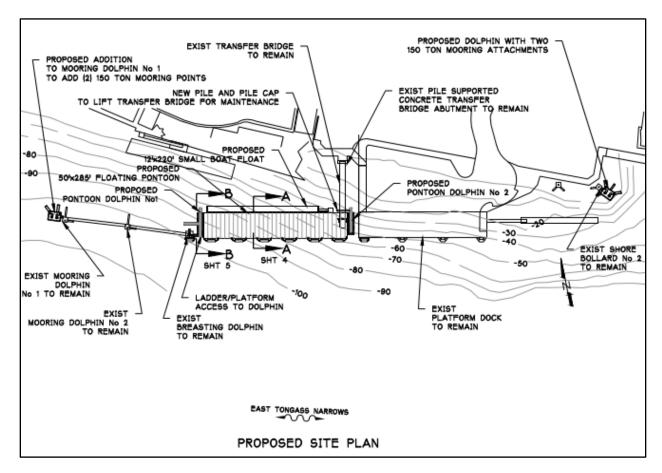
Proposed site plan for Ketchikan Dock Company's Berth IV showing new structures to be installed and existing structures to remain.
